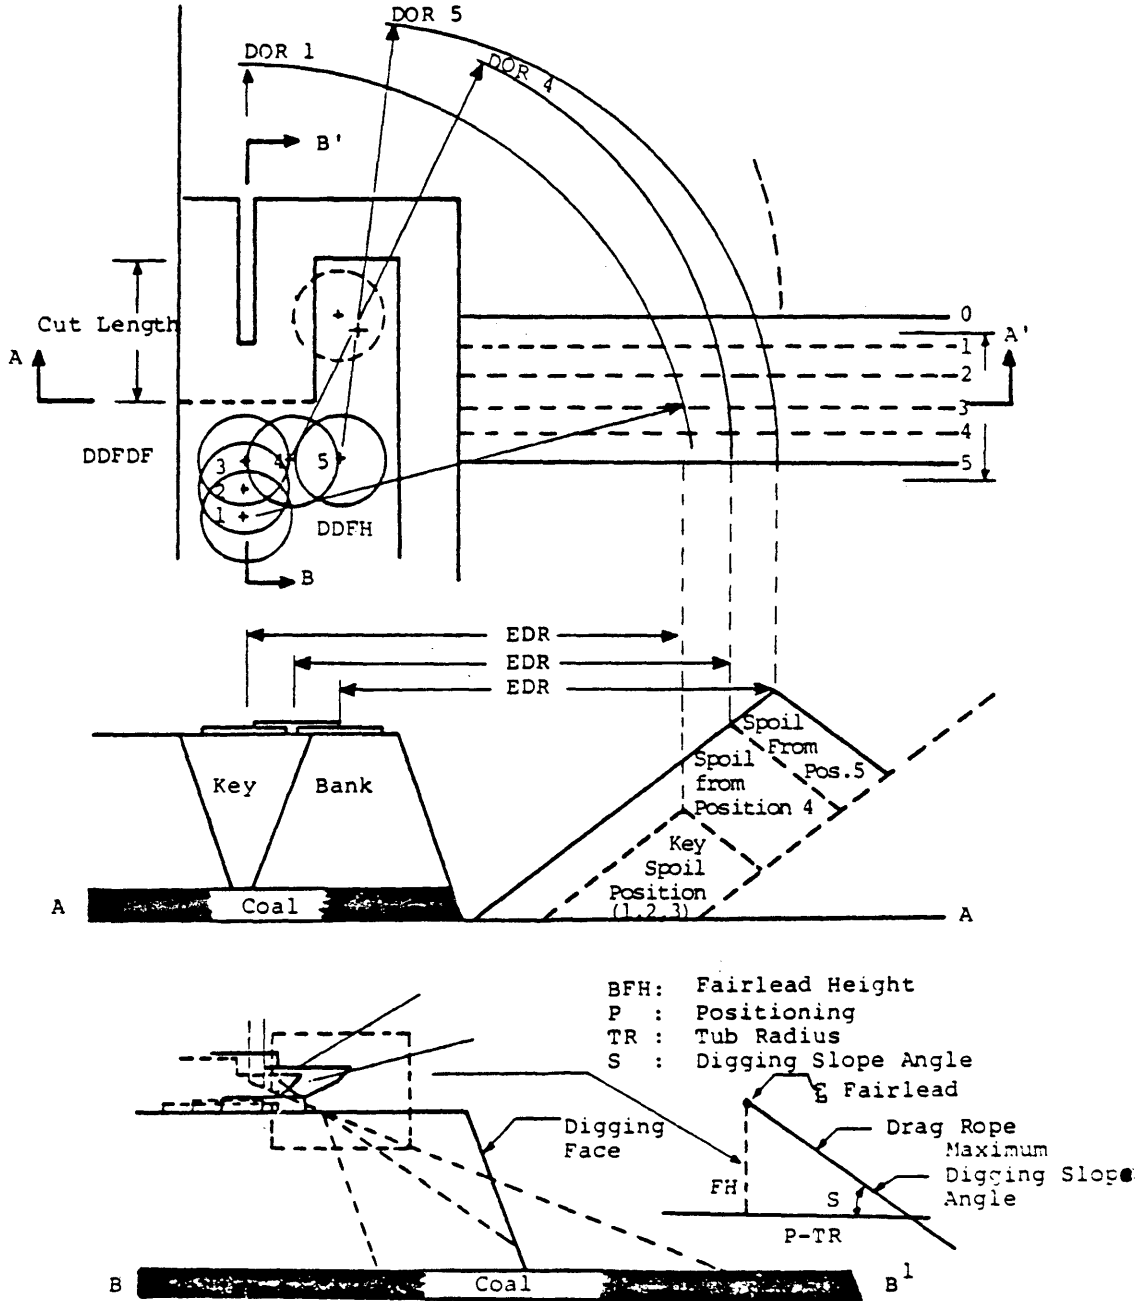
Plan and Cross Sectional Views of Dragline Positions with Respect to Crest of Digging Face and Highwall.
